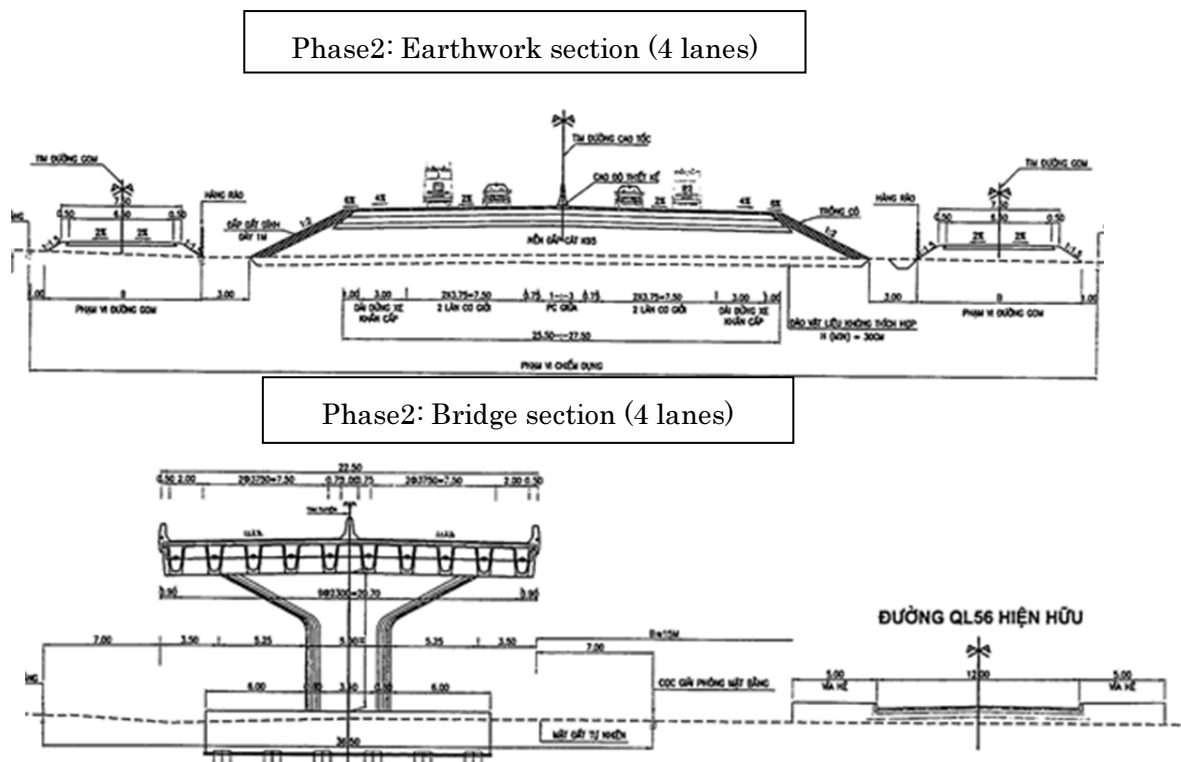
Typical Cross Section of Phu My IC (Km37+600)-NH51 intersection (Km37+600)
